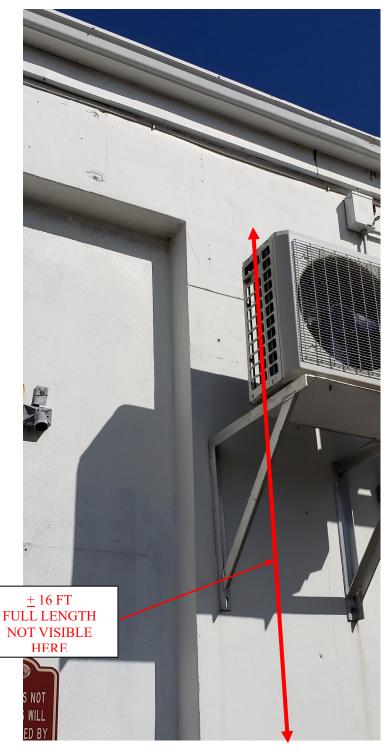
Front Elevation near roundabout. Location 3: Approximately 16 ft long new 16x16 concrete column. See detail 1/S101.
